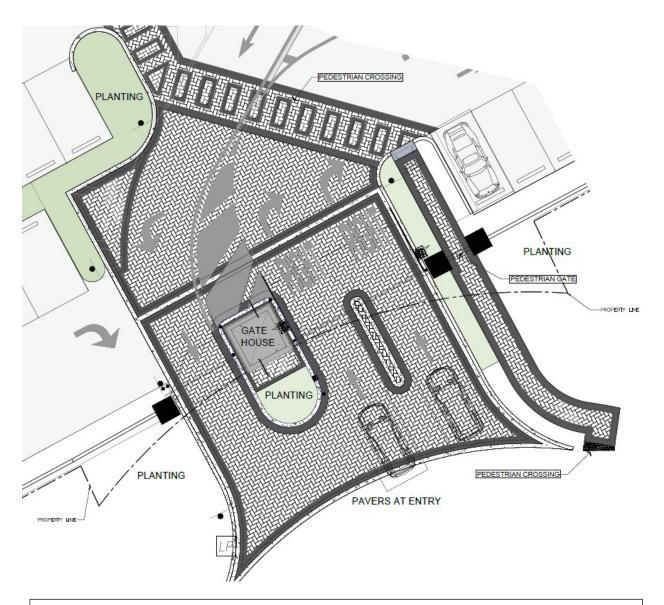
Conceptual aerial view of the gate entry with proposed traffic concrete paver areas in gray, including sidewalk connecting to corner of C&D building and to the roadside.
